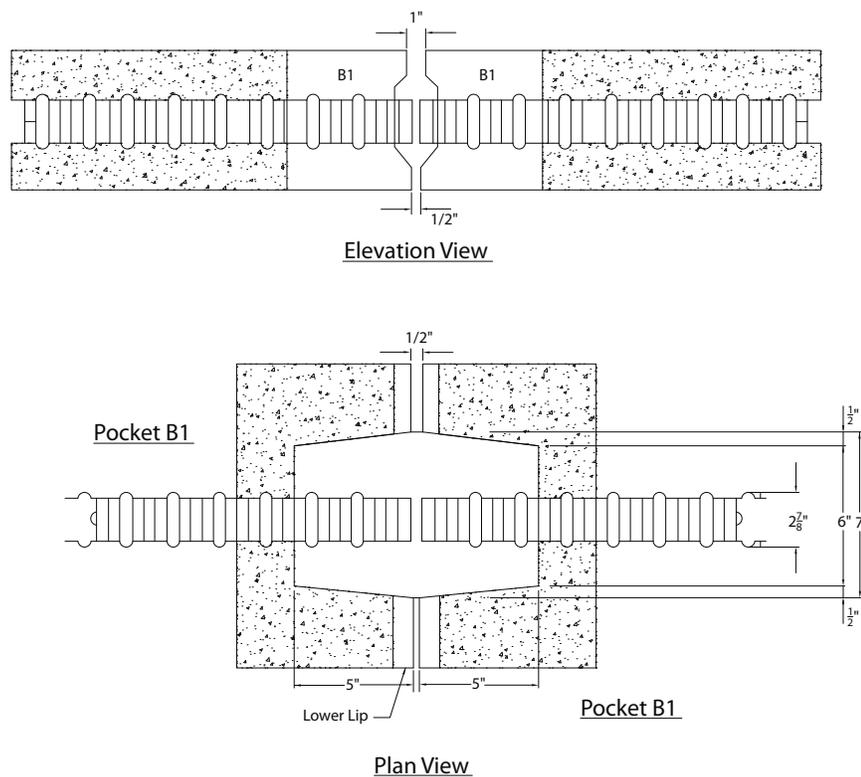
Typical layout of sheath ducts across the transverse joint.
